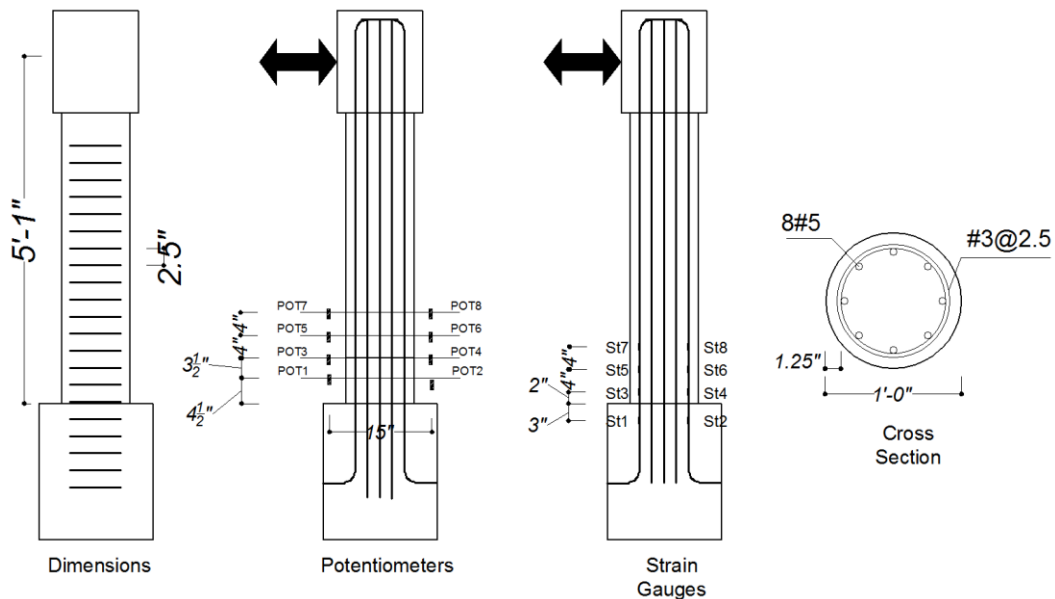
Specimens S-5-R details, dimensions, reinforcement and installed measurement tools.
